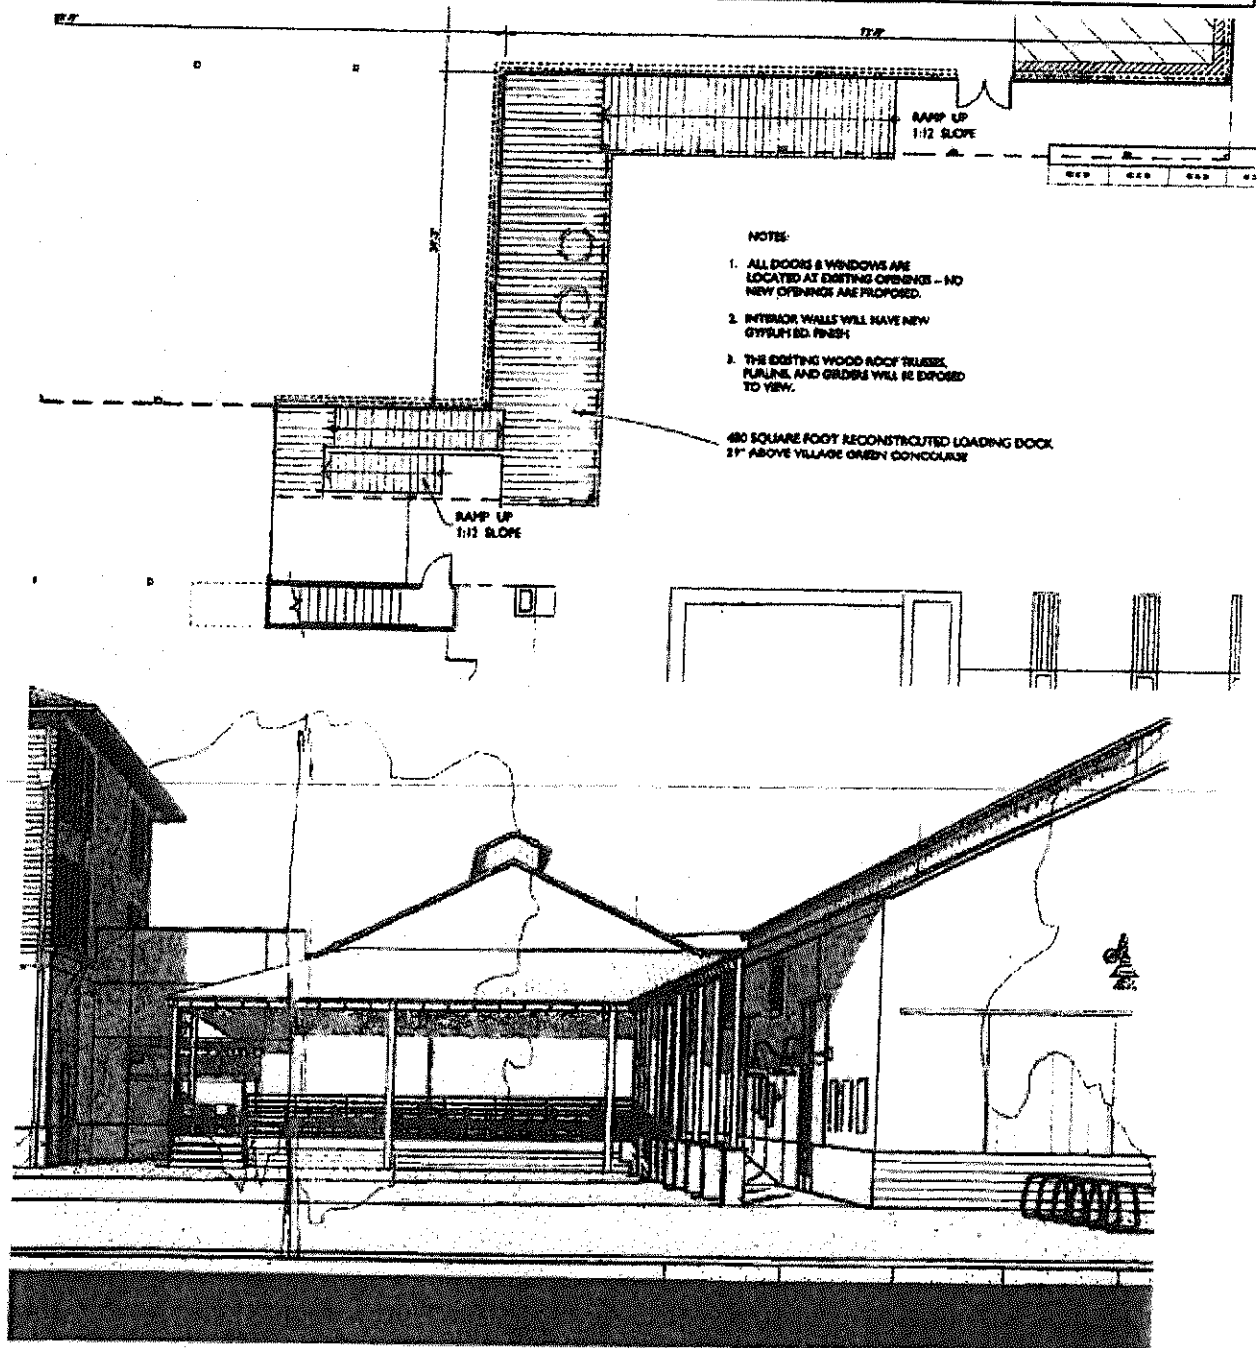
Top Figure: Approved Historic Preservation Plan depicting seating area/ loading dock in plan view along south elevation, with 2 access ramps
